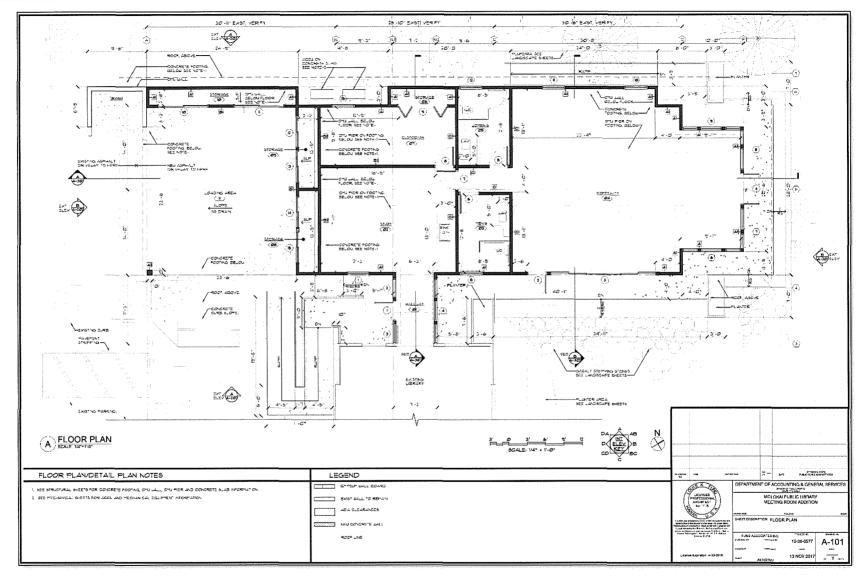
Proposed floor plan showing the location of the existing library (bottom) in relation to the meeting room addition (plan courtesy of Fung Associates, Inc.).
